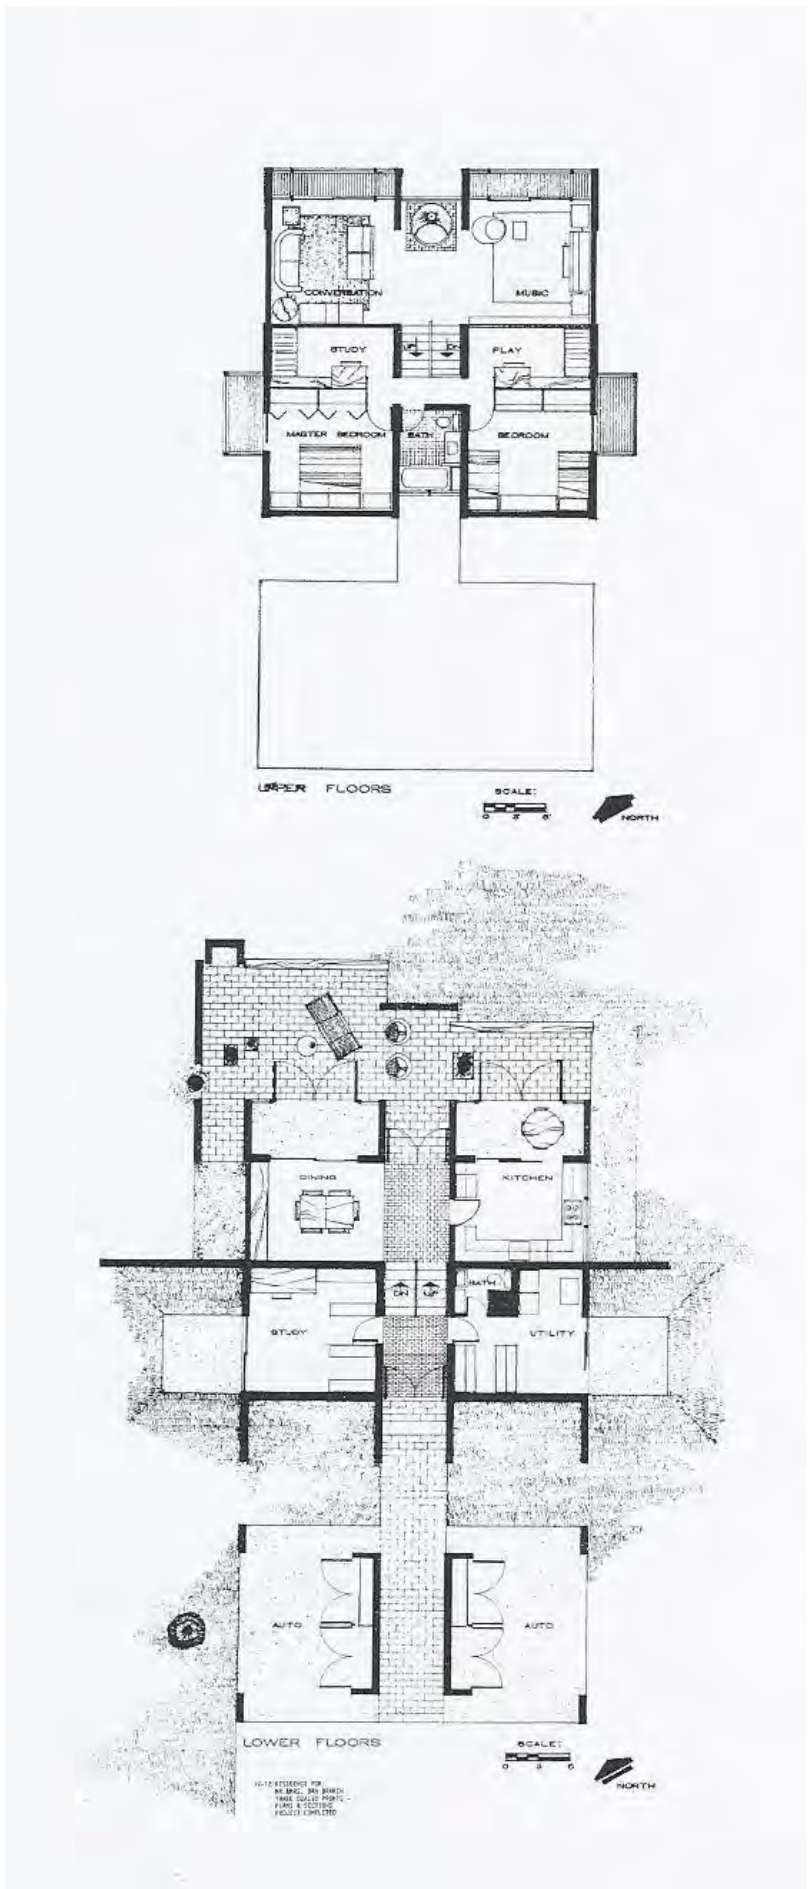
Original floor plans of the Dan Branch House, 1965. (From *Florida Modern*, Jan Hochstim, p. 238)
